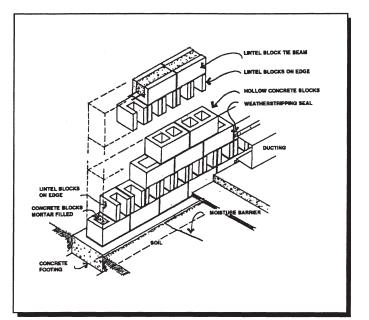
Interior Concrete Block Wall (Lee Residence)
